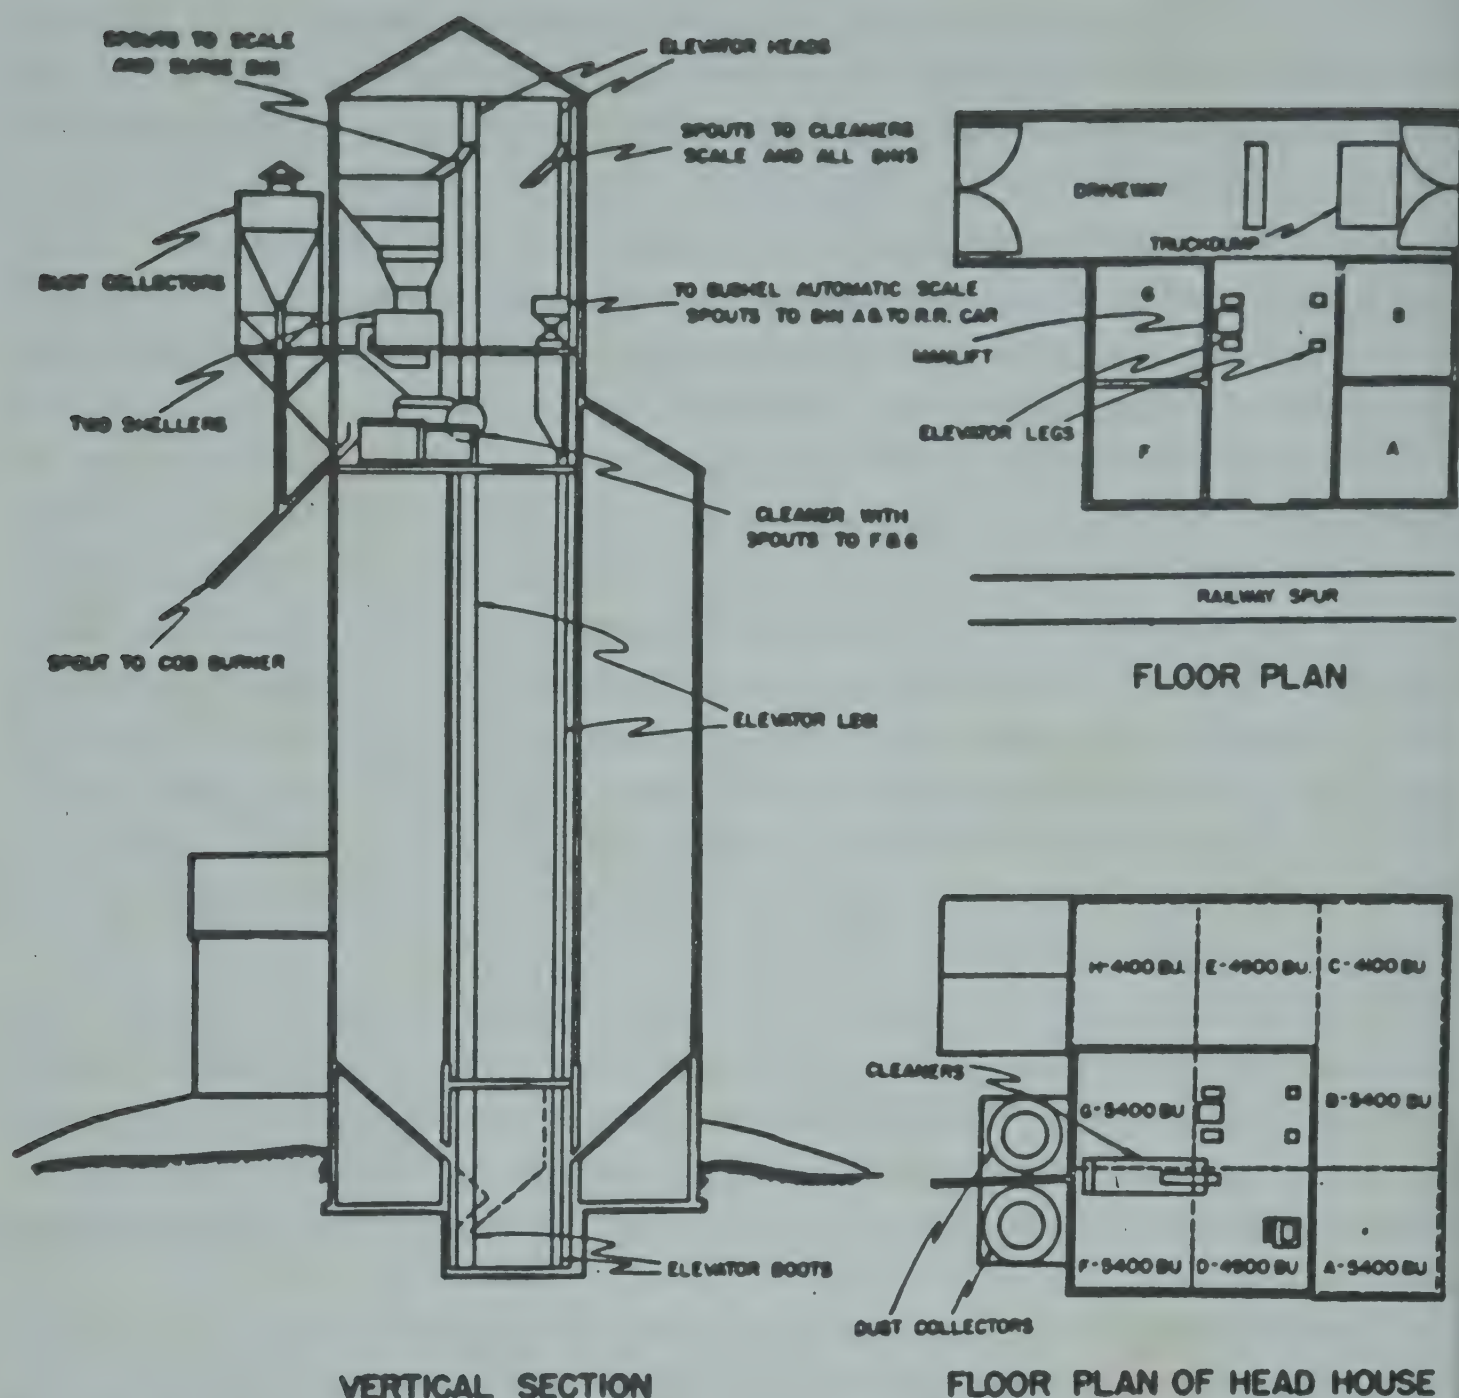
Vertical section and floor plans of a typical country elevator of wood construction showing grain handling, corn shelling, grain cleaning, and weighing equipment. (Taken from plans by the Harry E. Surface Co., Kansas City, Mo.)
